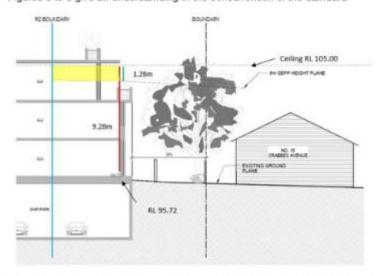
Extract of Section A east/west through proposed Block B. R2 boundary shown on the section as blue and built form above the 8m SEPP height limit within the R2 zone highlighted yellow (Source: Hyecorp/Amglen)
